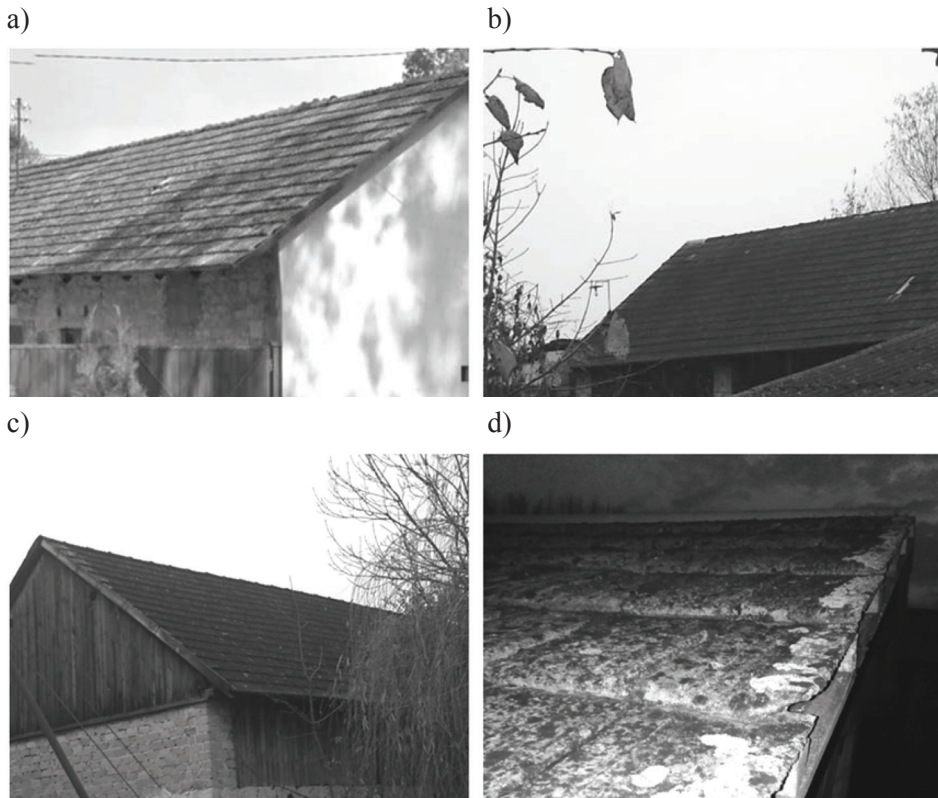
Examples of outbuildings in Bogucice with concrete tiles roofing:
